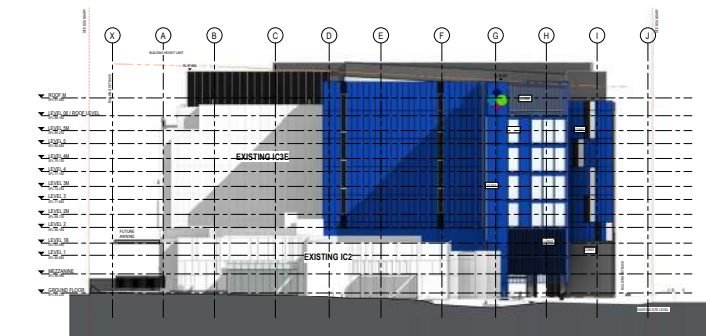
Proposed SSD IC3W - North Elevation (Source: HDR)
